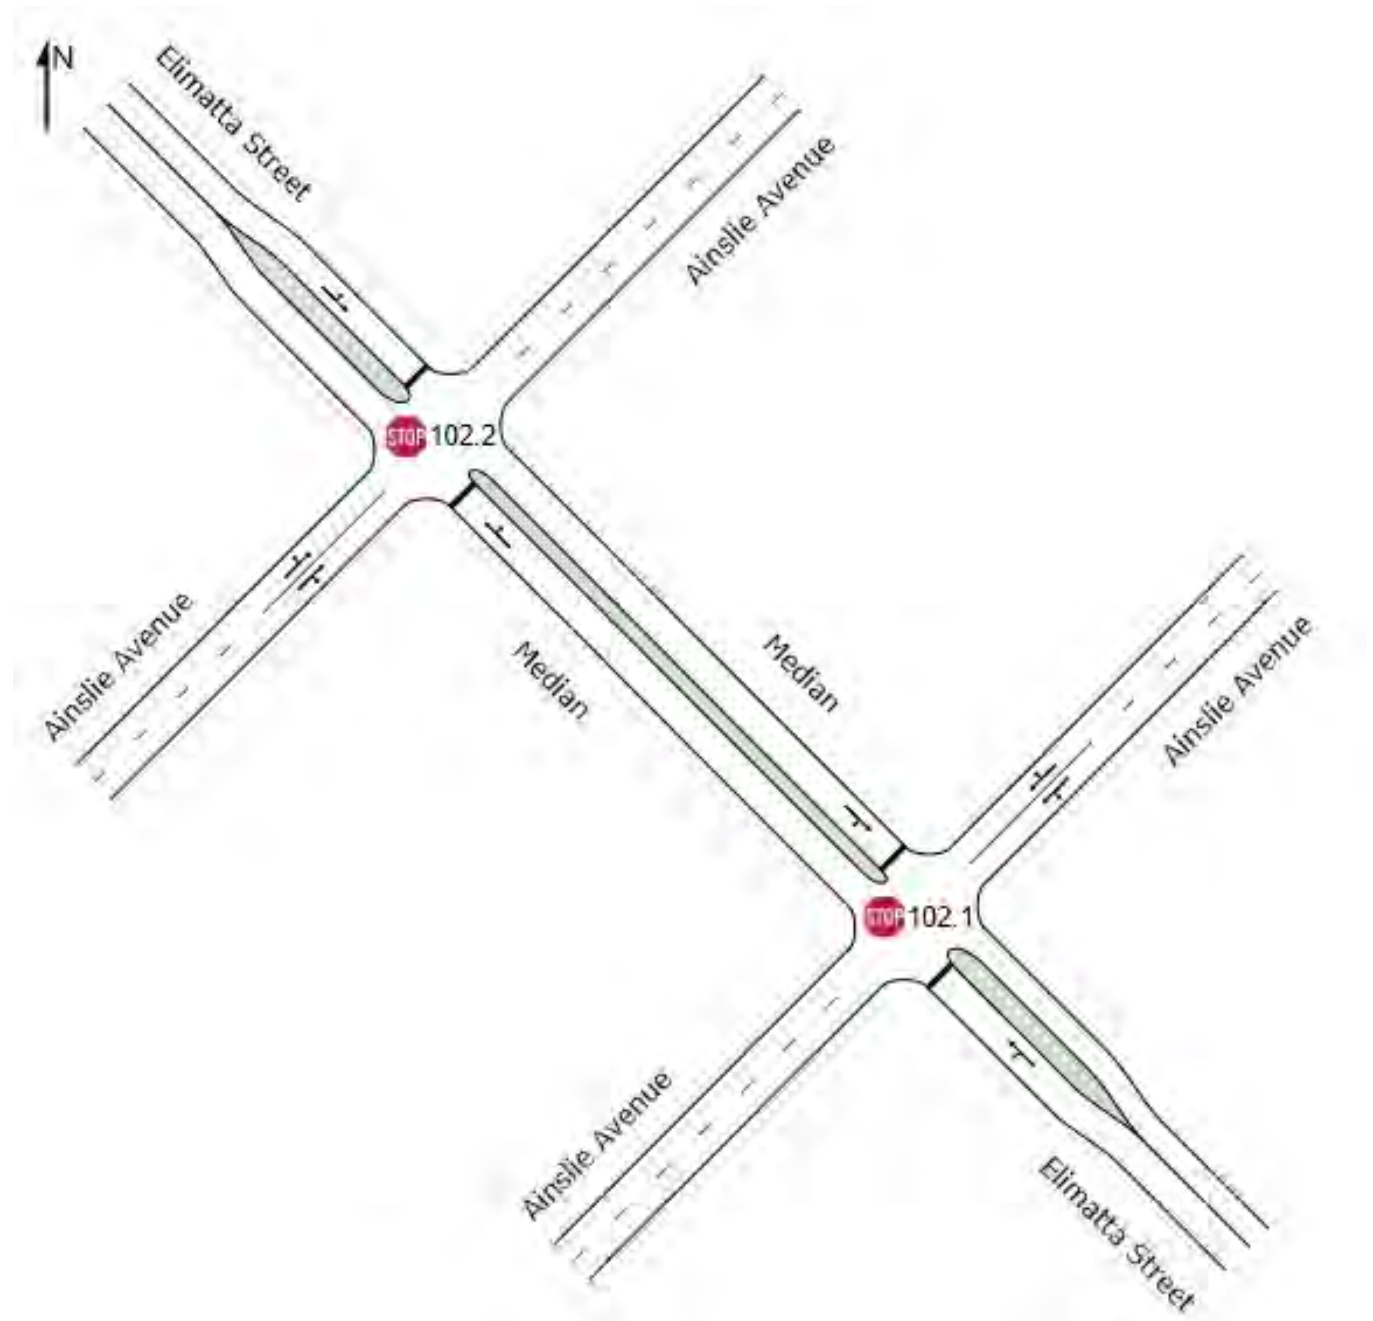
Current Intersection Layout – Ainslie Avenue / Elimatta Street
